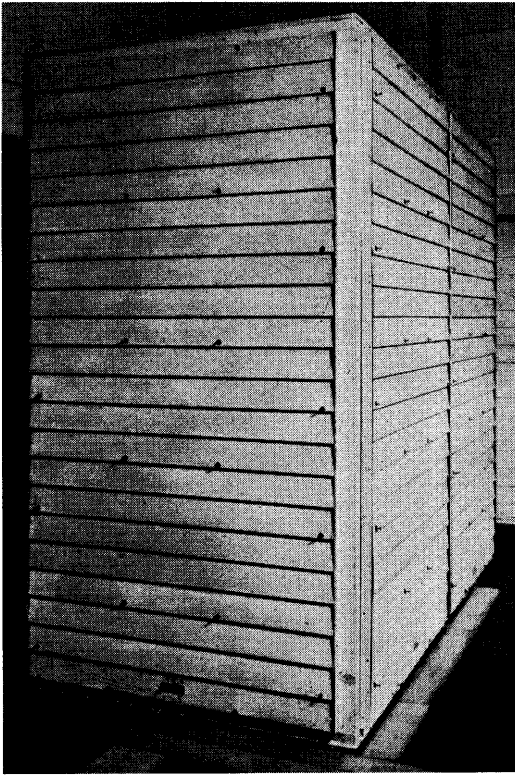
TEST HOUSE USED FOR WET PLASTER TEST AND ALSO SUBSEQUENT TESTS ON WALL VENTILATION
